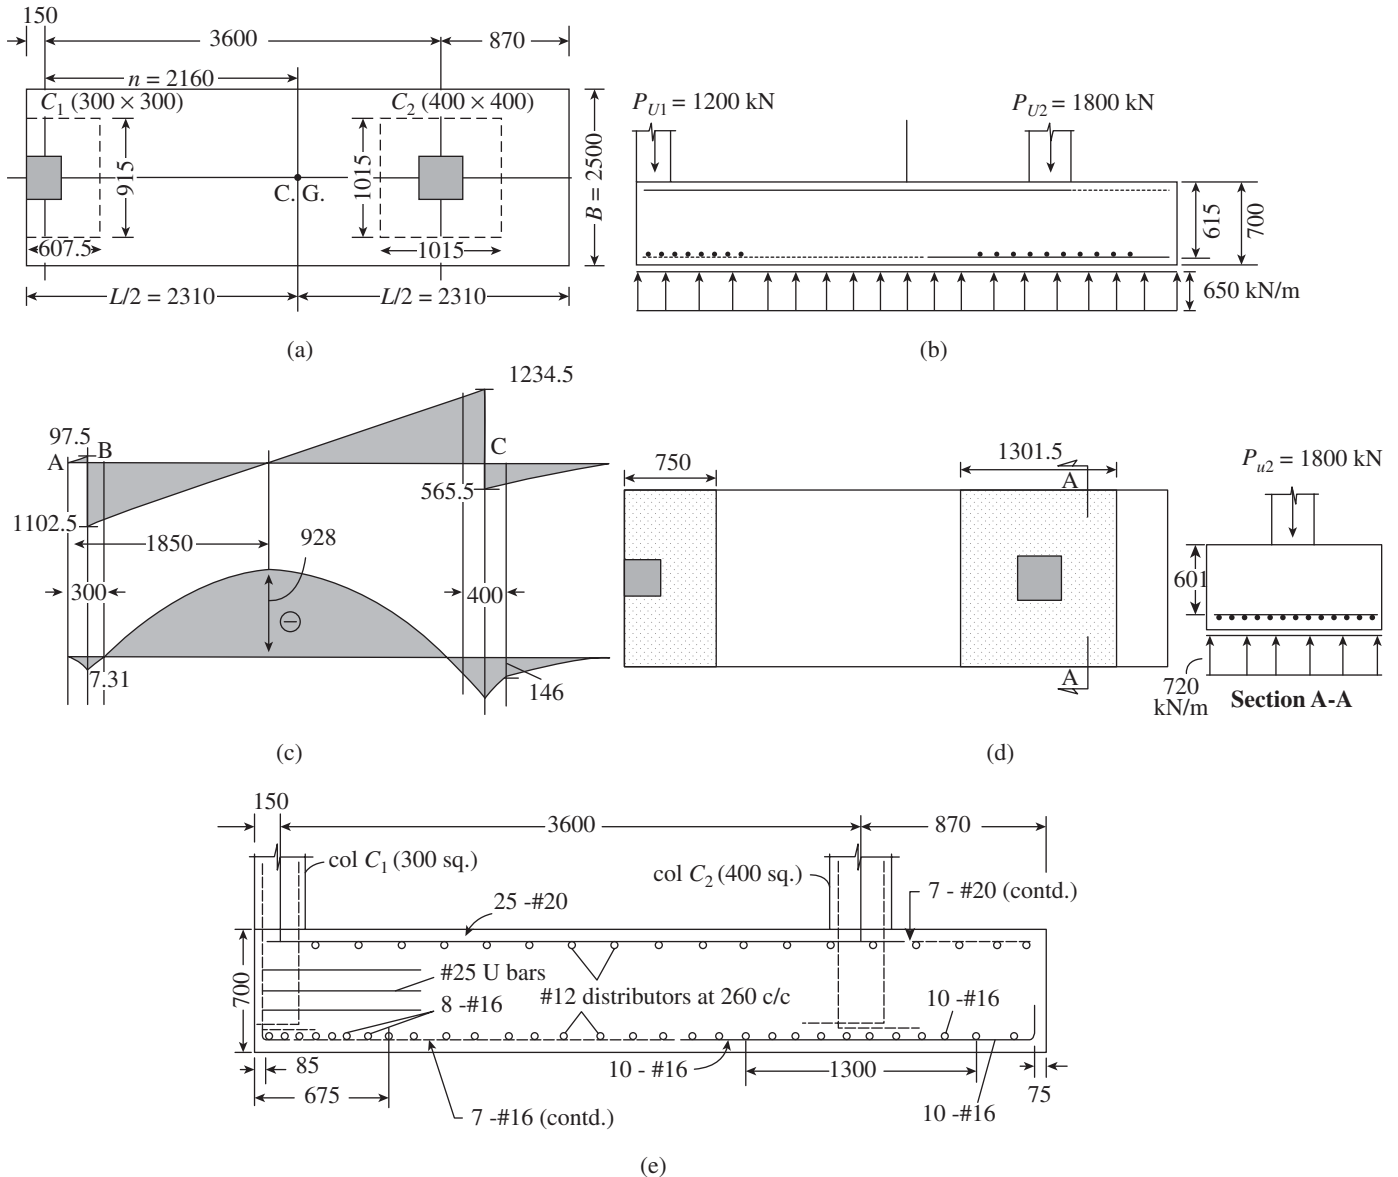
Combined footing of Example 15.6 (a) Plan (b) Footing (c) Shear force and bending moment diagram (d) Column strips acting as transverse beams (e) Reinforcement detailing
